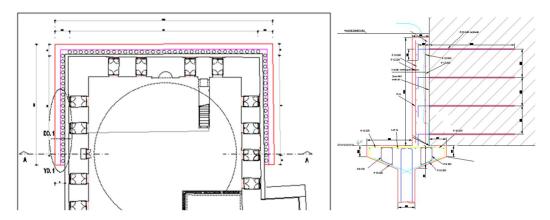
Mini pile Project (left), foundation anchor, head beam and mini pile detail (right) (6)
